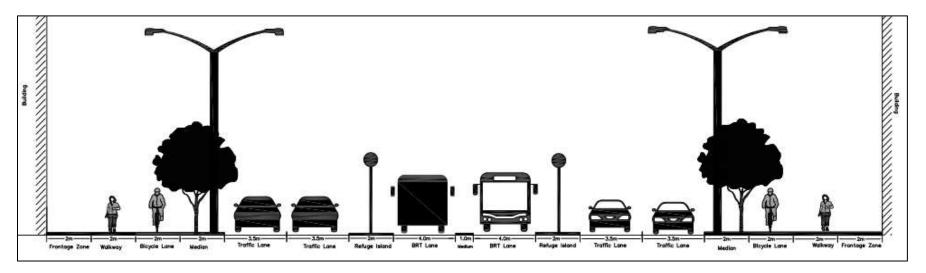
Type 1A: Urban Arterial 60m ROW (With BRT Travel Lanes)
